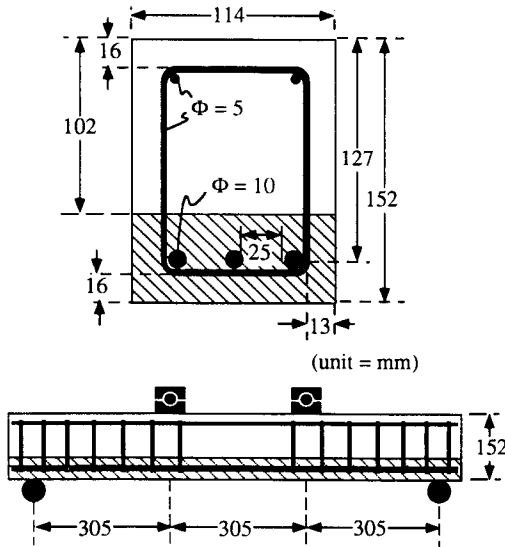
Geometry of the reinforced concrete beam with ECC layer and reinforcement details.
